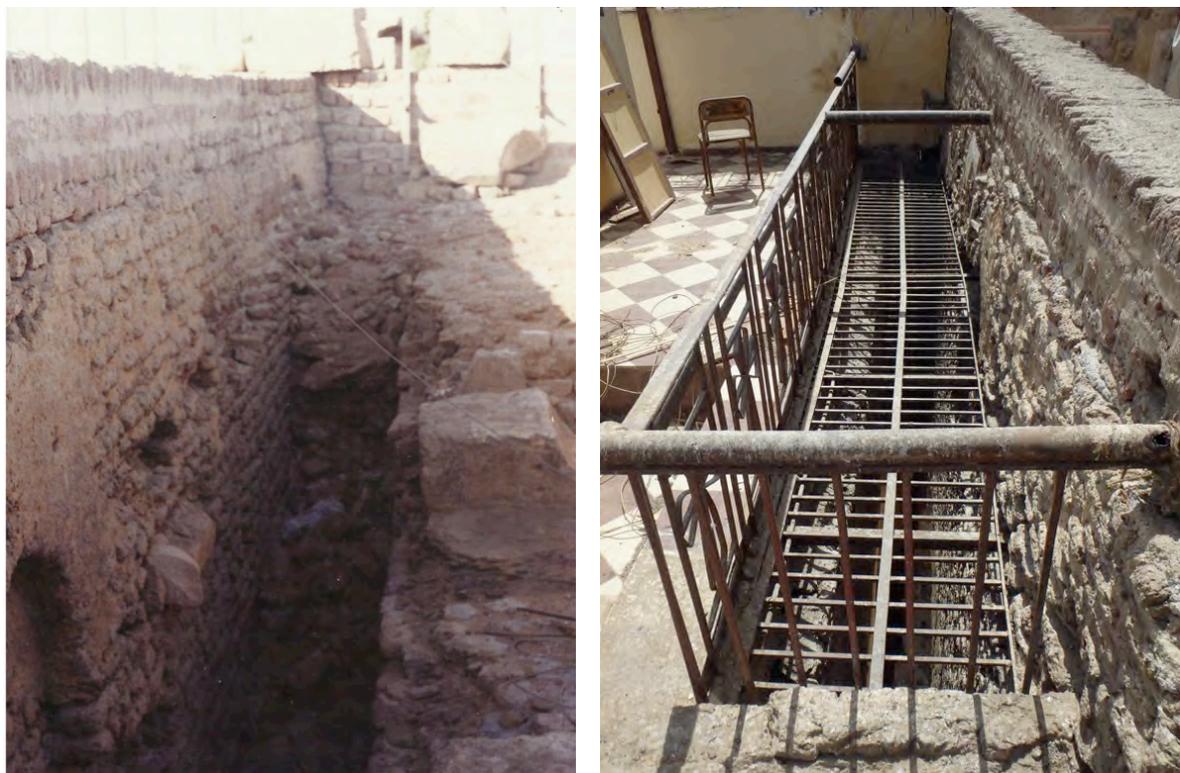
The gap between the north wall of the tower before (left) and after (right) the installation of the metal grille and handrail in 1995-96
